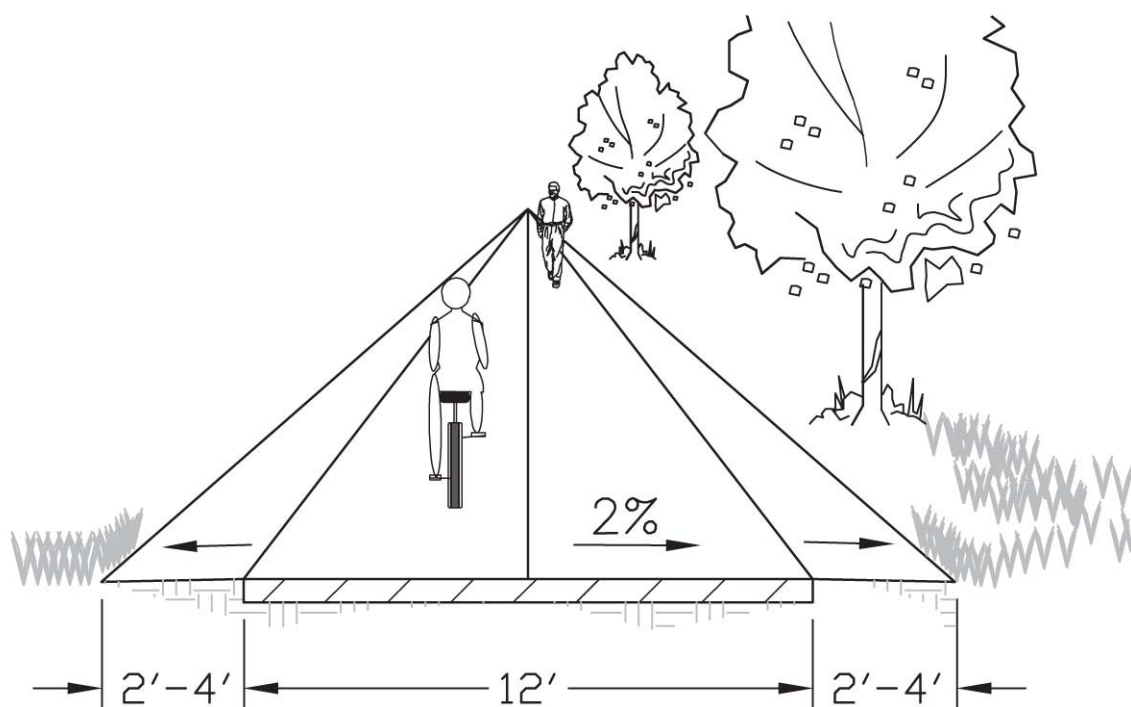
Typical Off-Corridor Class I Multi-Use Path Section
